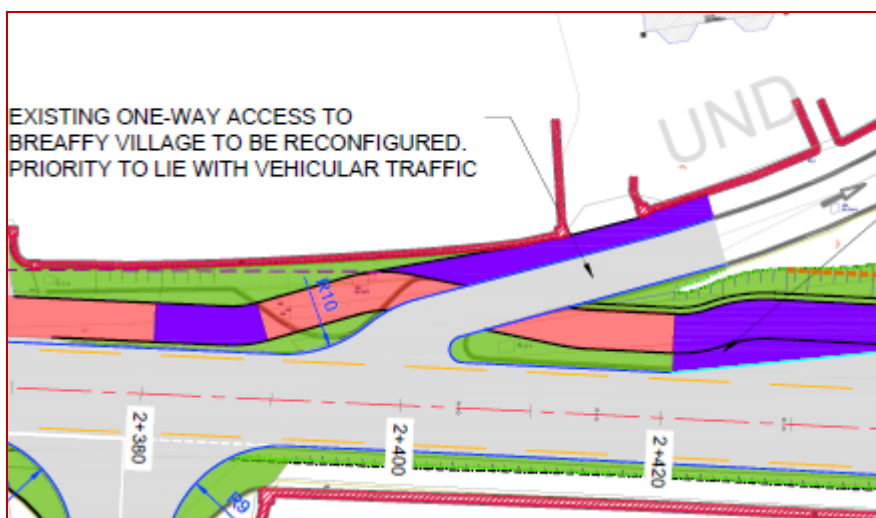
Proposed Crossing Point at One-Way Access to Breaffy Village
